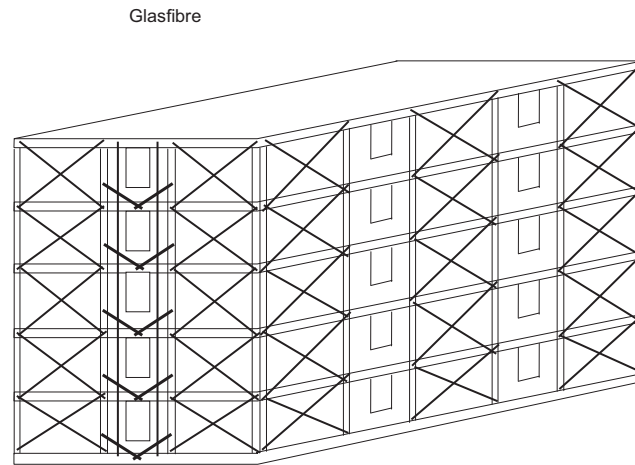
Axonometric view of the layout of glas fibre retrofit of infill masonry walls in model “Oezzi”
